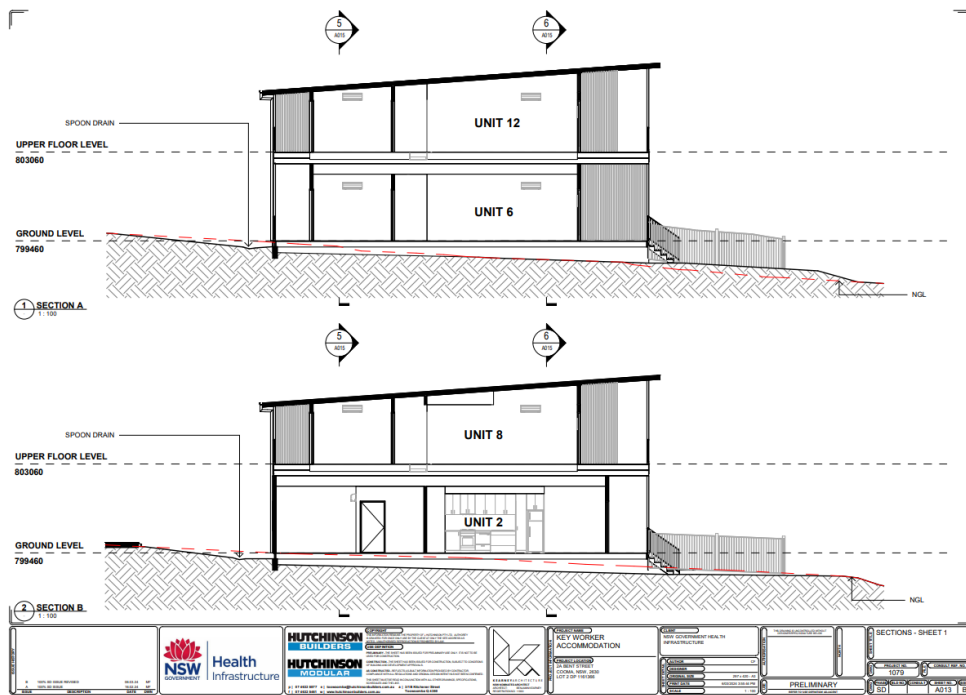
Sections – Sheet 1 (Source: Kearney Architecture)
